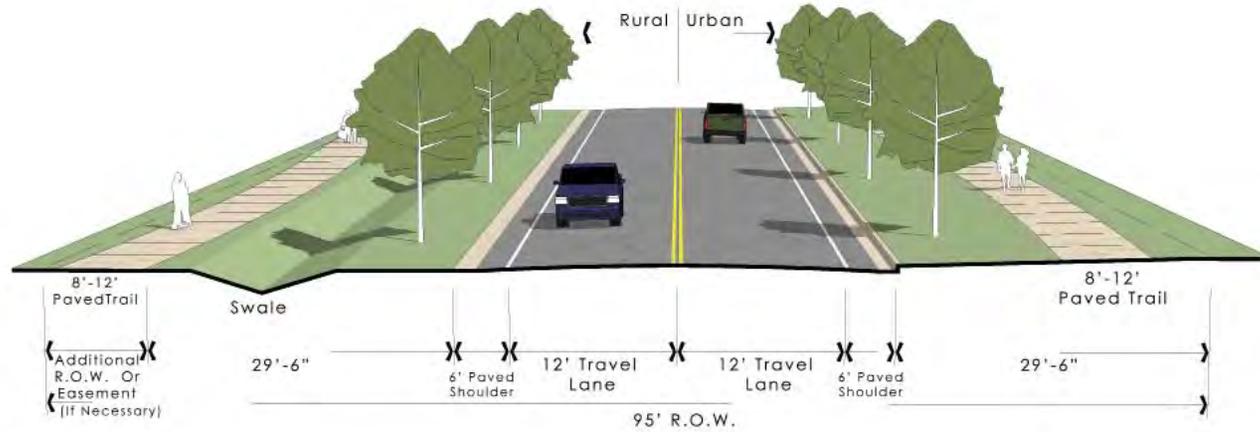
Major Collector Street – Rural or Urban Three-Lane Cross-Section
